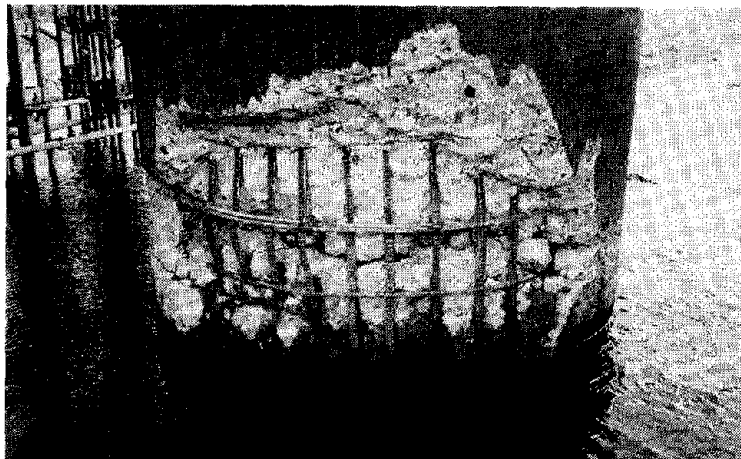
Damage of Pier P3 at Shin-shiriuchi Bridge
